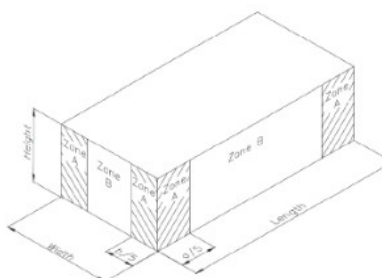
Excerpt from Rockpanel calculations Section 3 – Fastening System
